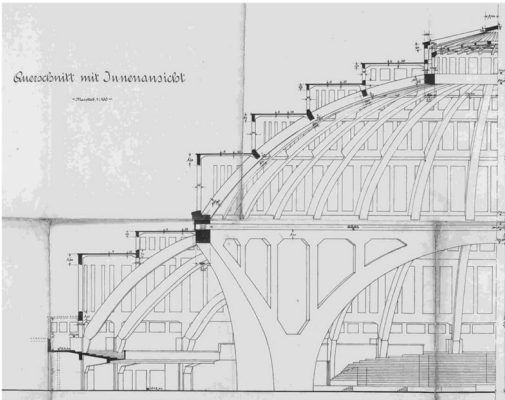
Dome of the Centennial Hall in Wrocław – archival drawing (City Building Archive).
